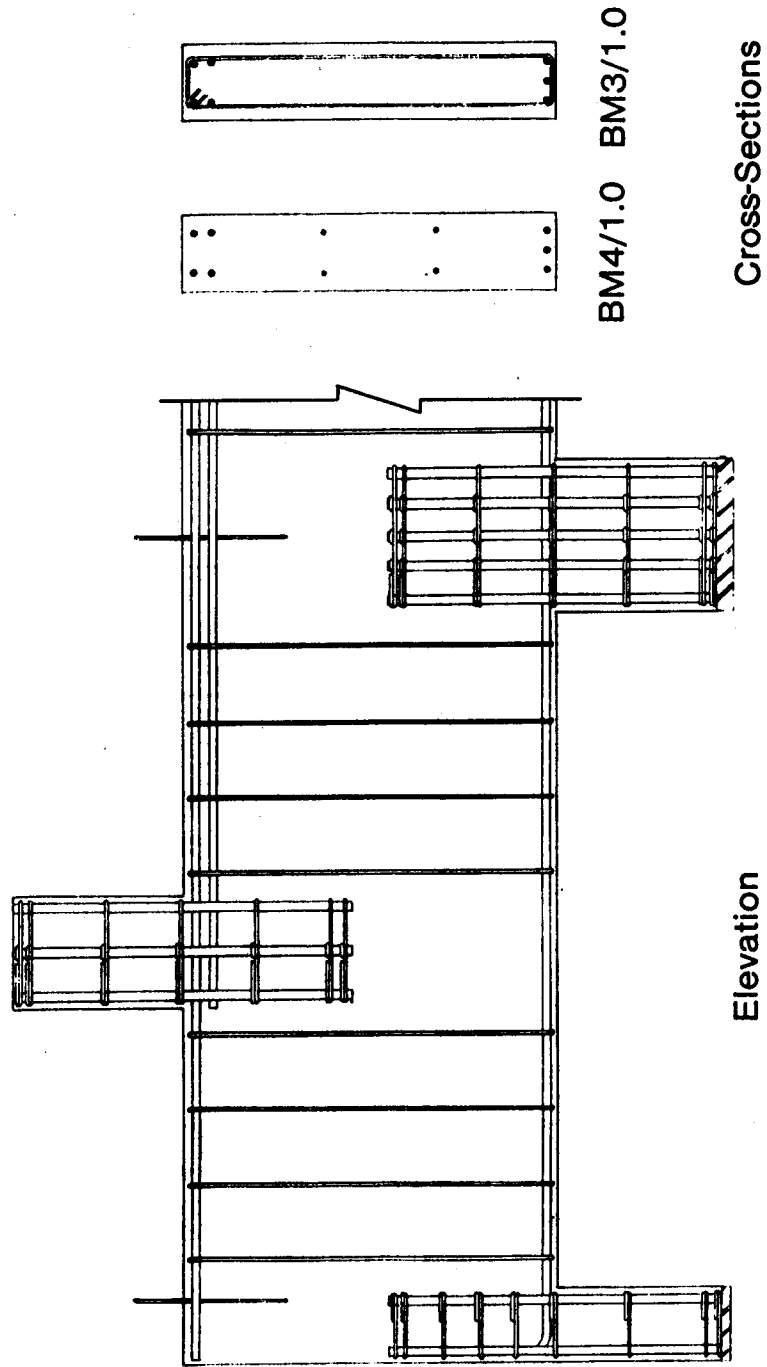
Beam 3/1.0 and 4/1.0 Reinforcement Details.
